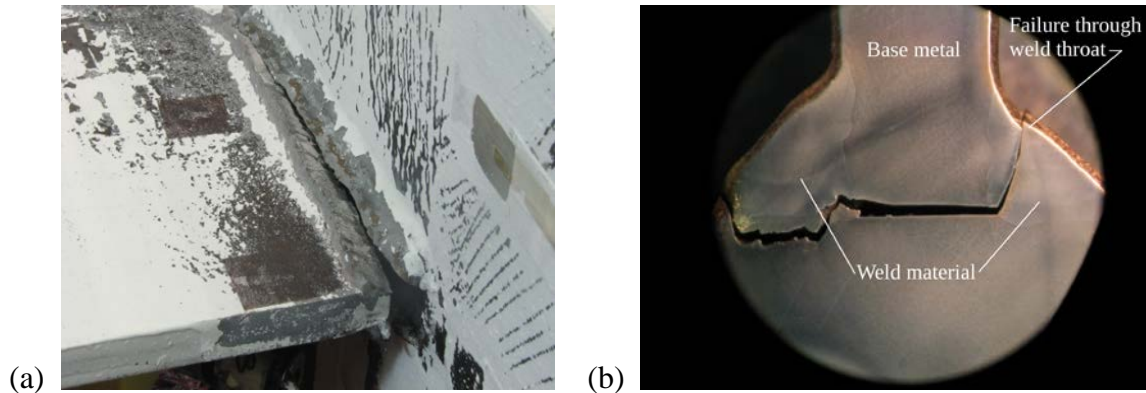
CN7 weld cross-sections: (a) toe of gusset plate; (b) middle of gusset plate.
